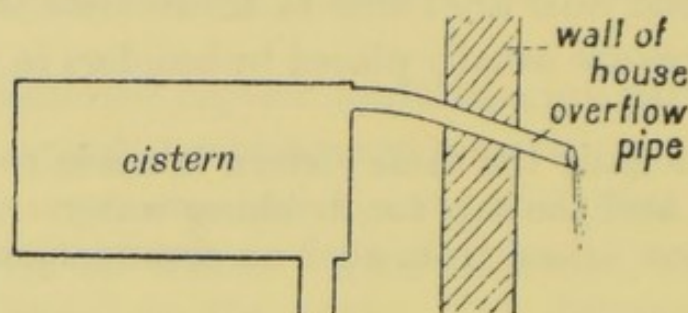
OVERFLOW PIPE AS IT SHOULD BE.
